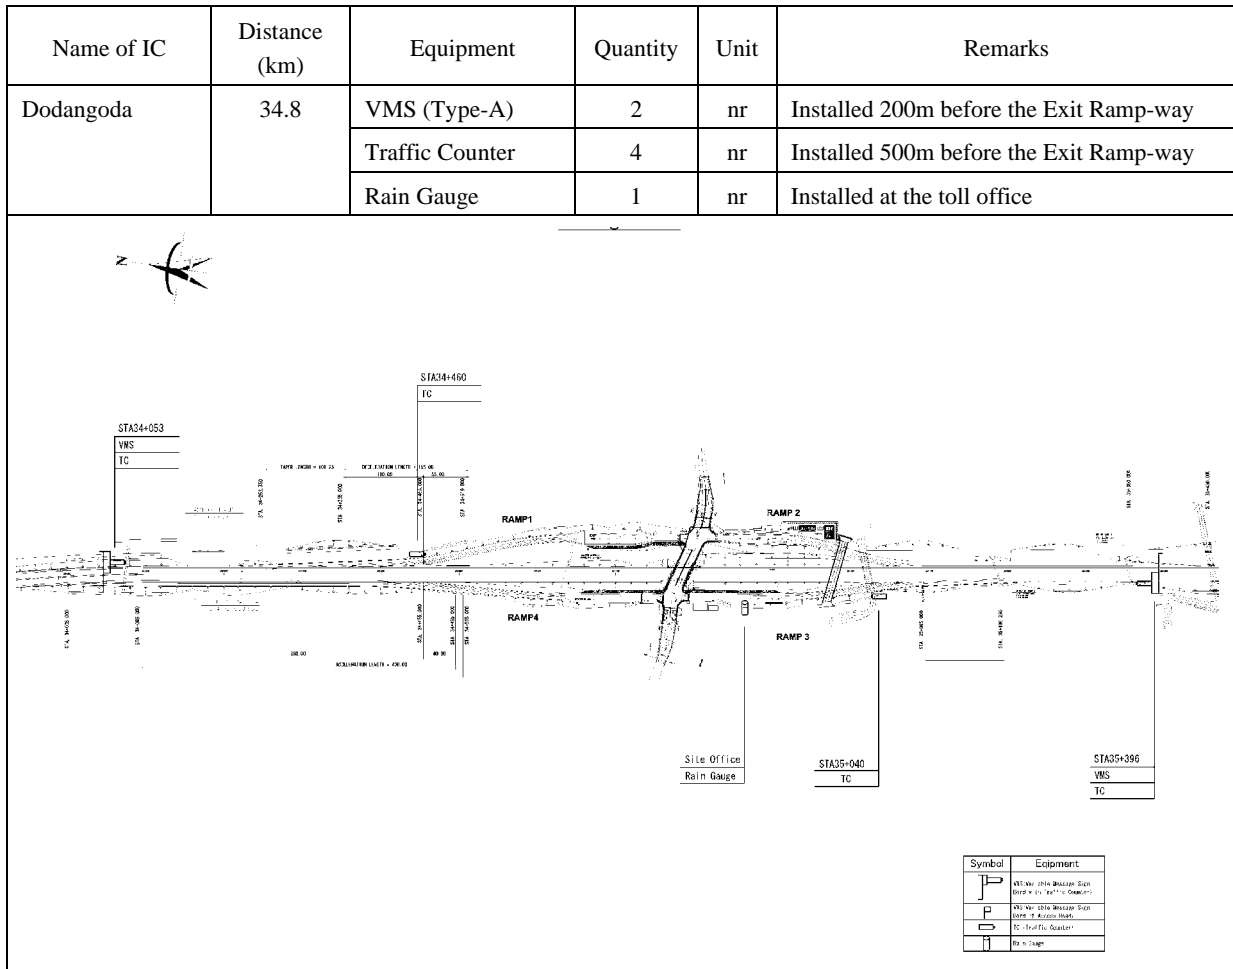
Road side equipment layout plan (Dodangoda IC)
